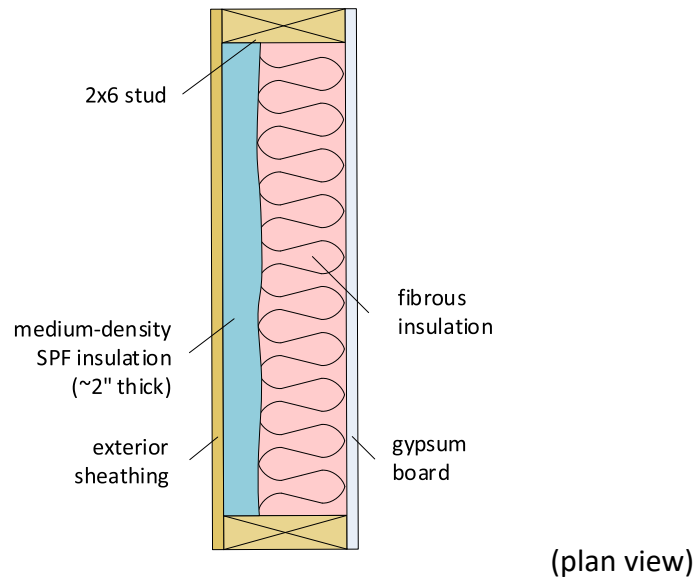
EXTERIOR WALLS (CAVITY)
